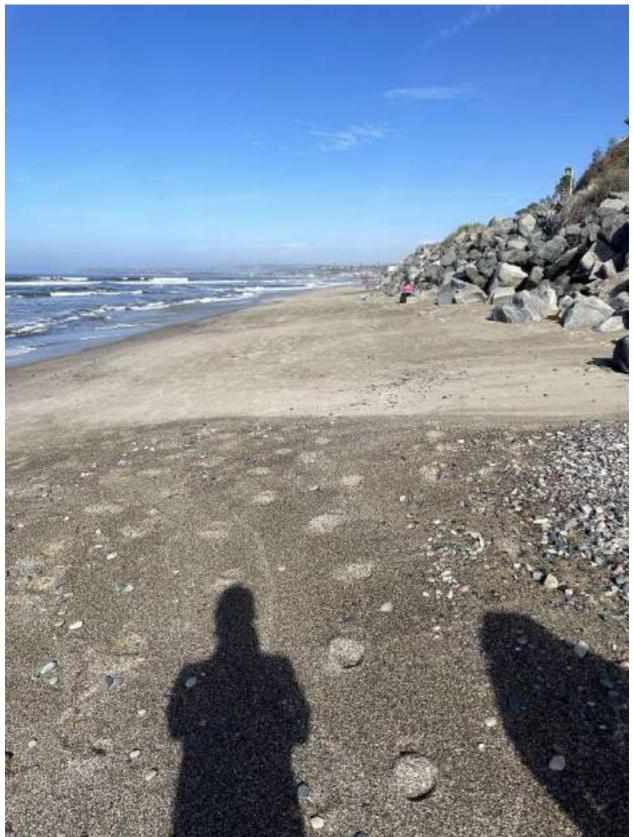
Existing beach condition at low tide facing northwest towards central repair area
